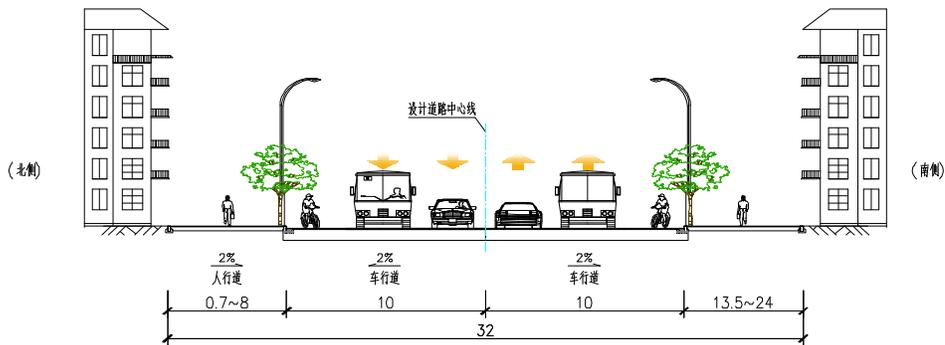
Profile design for East Outer Ring Road at Jinkou Village
